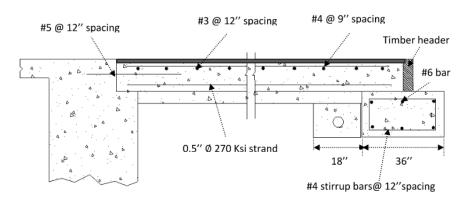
Longitudinal section of the approach slab (Gudimetla, 2012)
